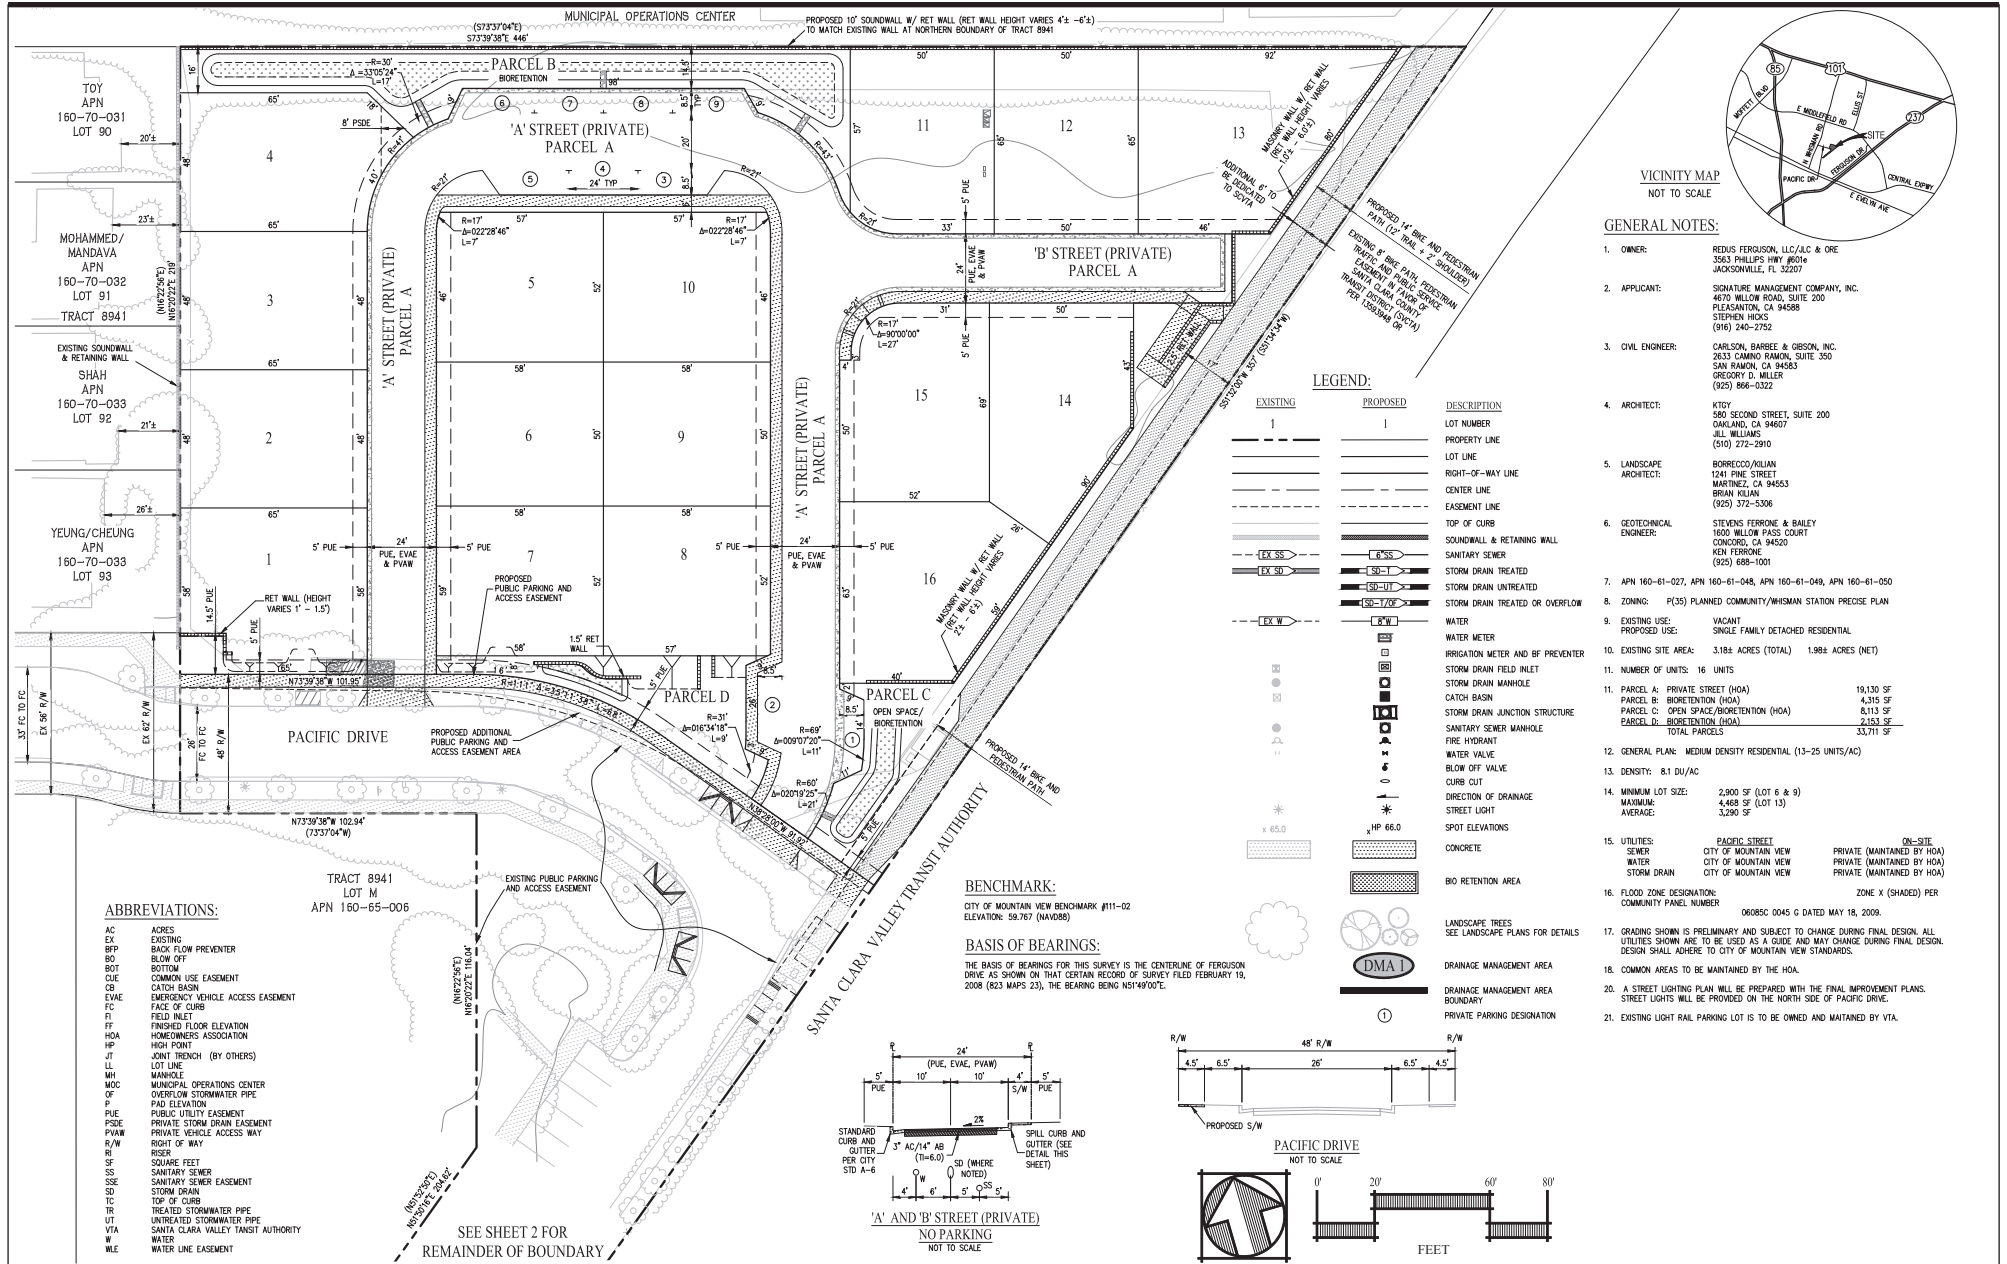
shows the Planned Unit Development Plan for the proposed project. The plan indicates that the proposed lots would range in size from 2,900 s.f. (Lots 6 and 9) to 4,468 s.f. (Lot 13), covering approximately 52,538 s.f. (60%) of the 1.98-acre site. The new two-story residences would be built to five floor plans and range in size from 1,833 s.f. to 2,180 s.f.
